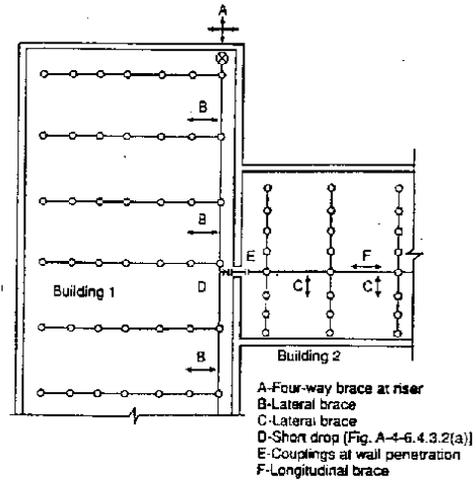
(a) Earthquake protection for sprinkler piping.
